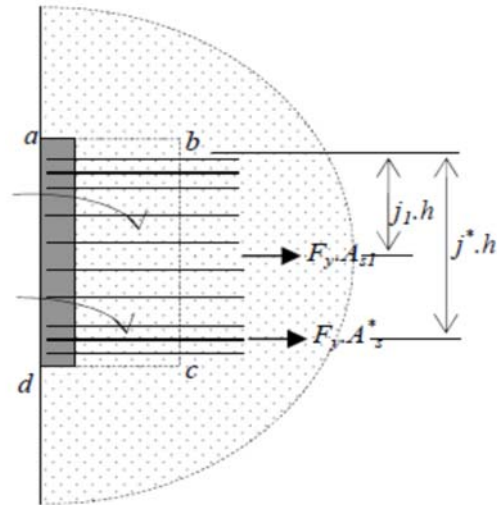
Wall to floor slab Connections (Surumi et al., 2015)
